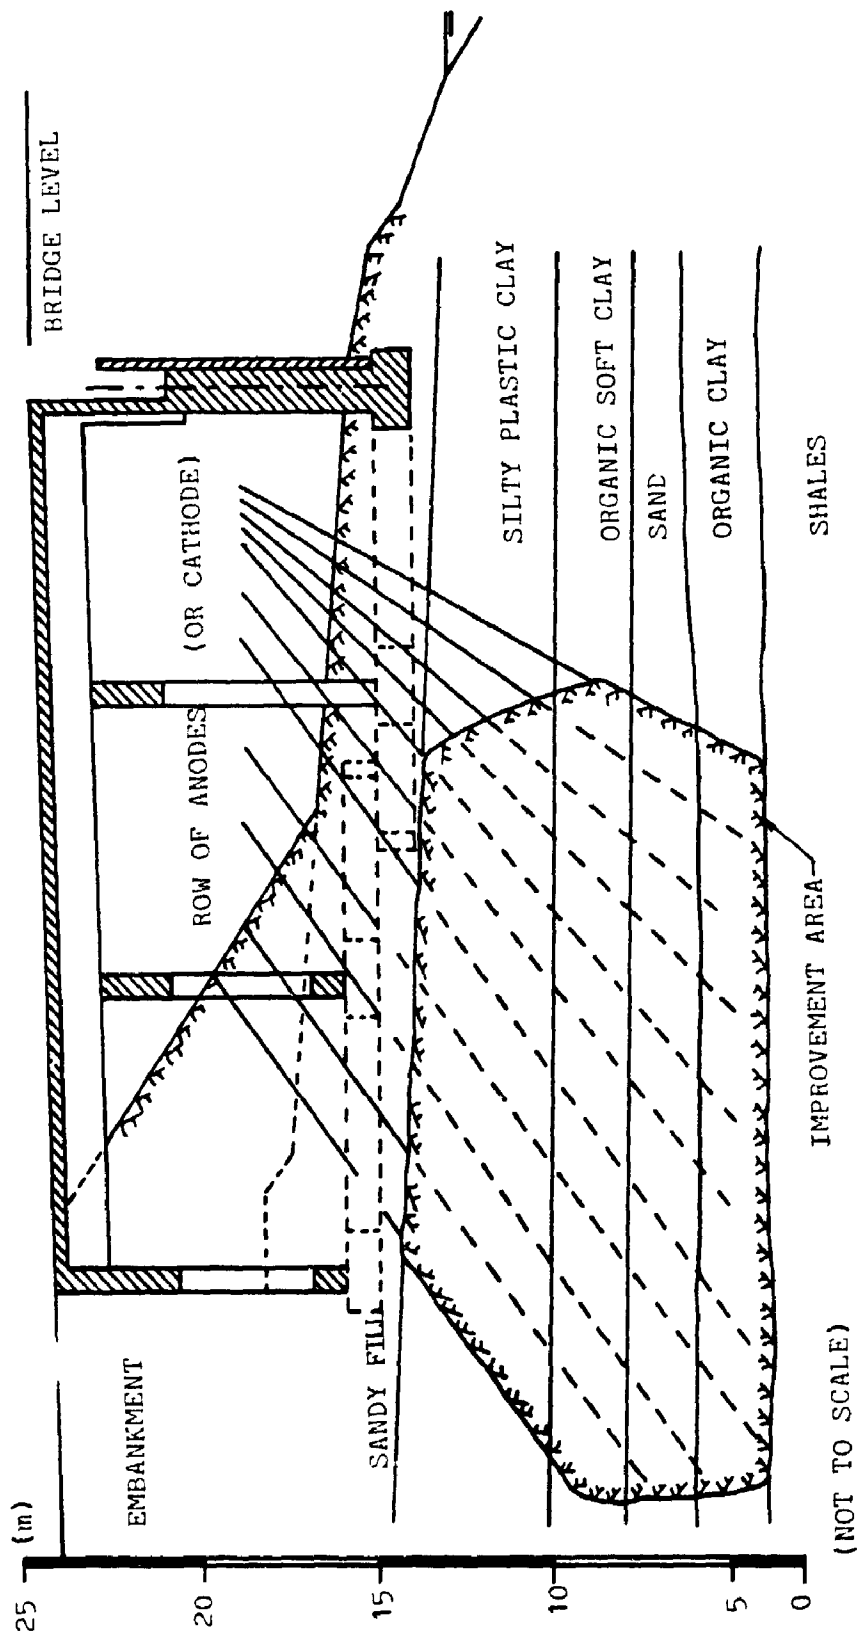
SOIL PROFILE UNDER THE BRIDGE ABUTMENT (after Caron 1971)
